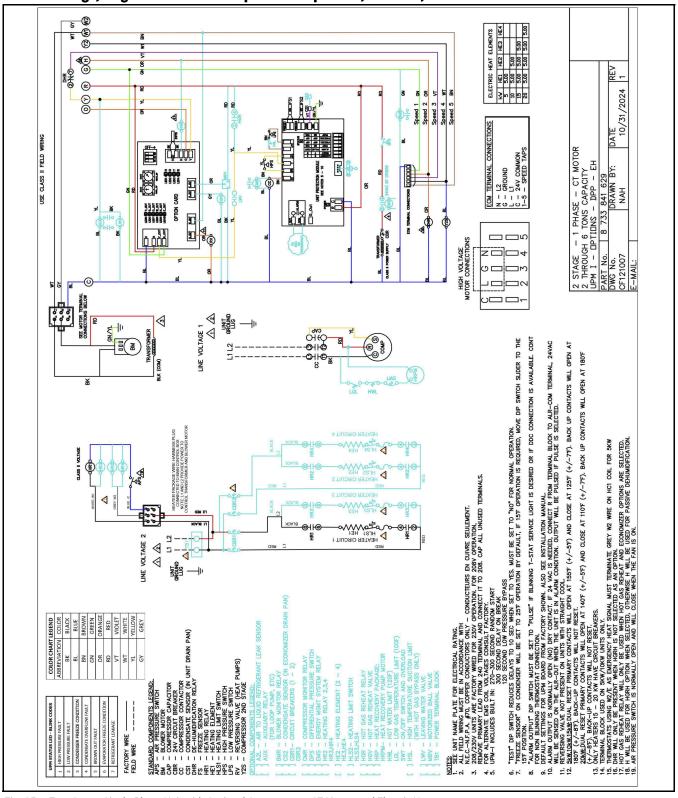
Two-Stage, Single-Phase Unit with Optional Components, CT Motor, and Electric Heat
